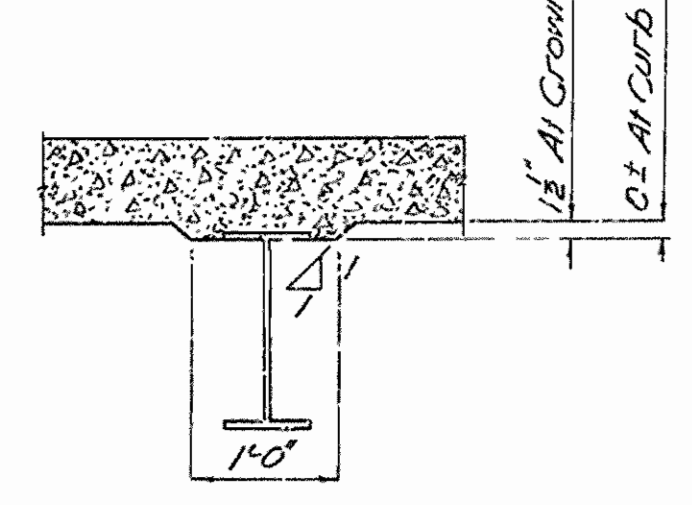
DETAIL OF JOINT IN FLOOR SLAB AT U16, U41
